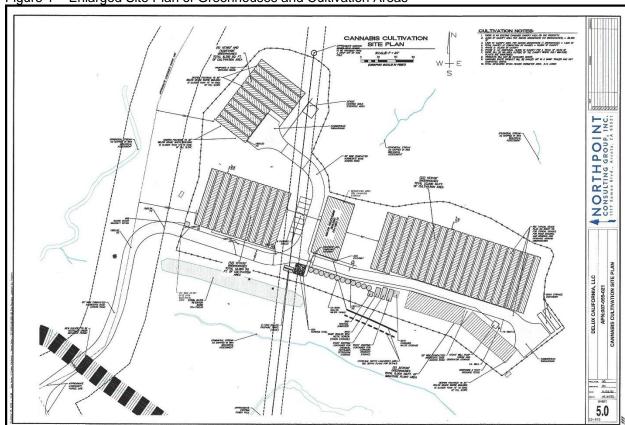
Enlarged Site Plan of Greenhouses and Cultivation Areas
